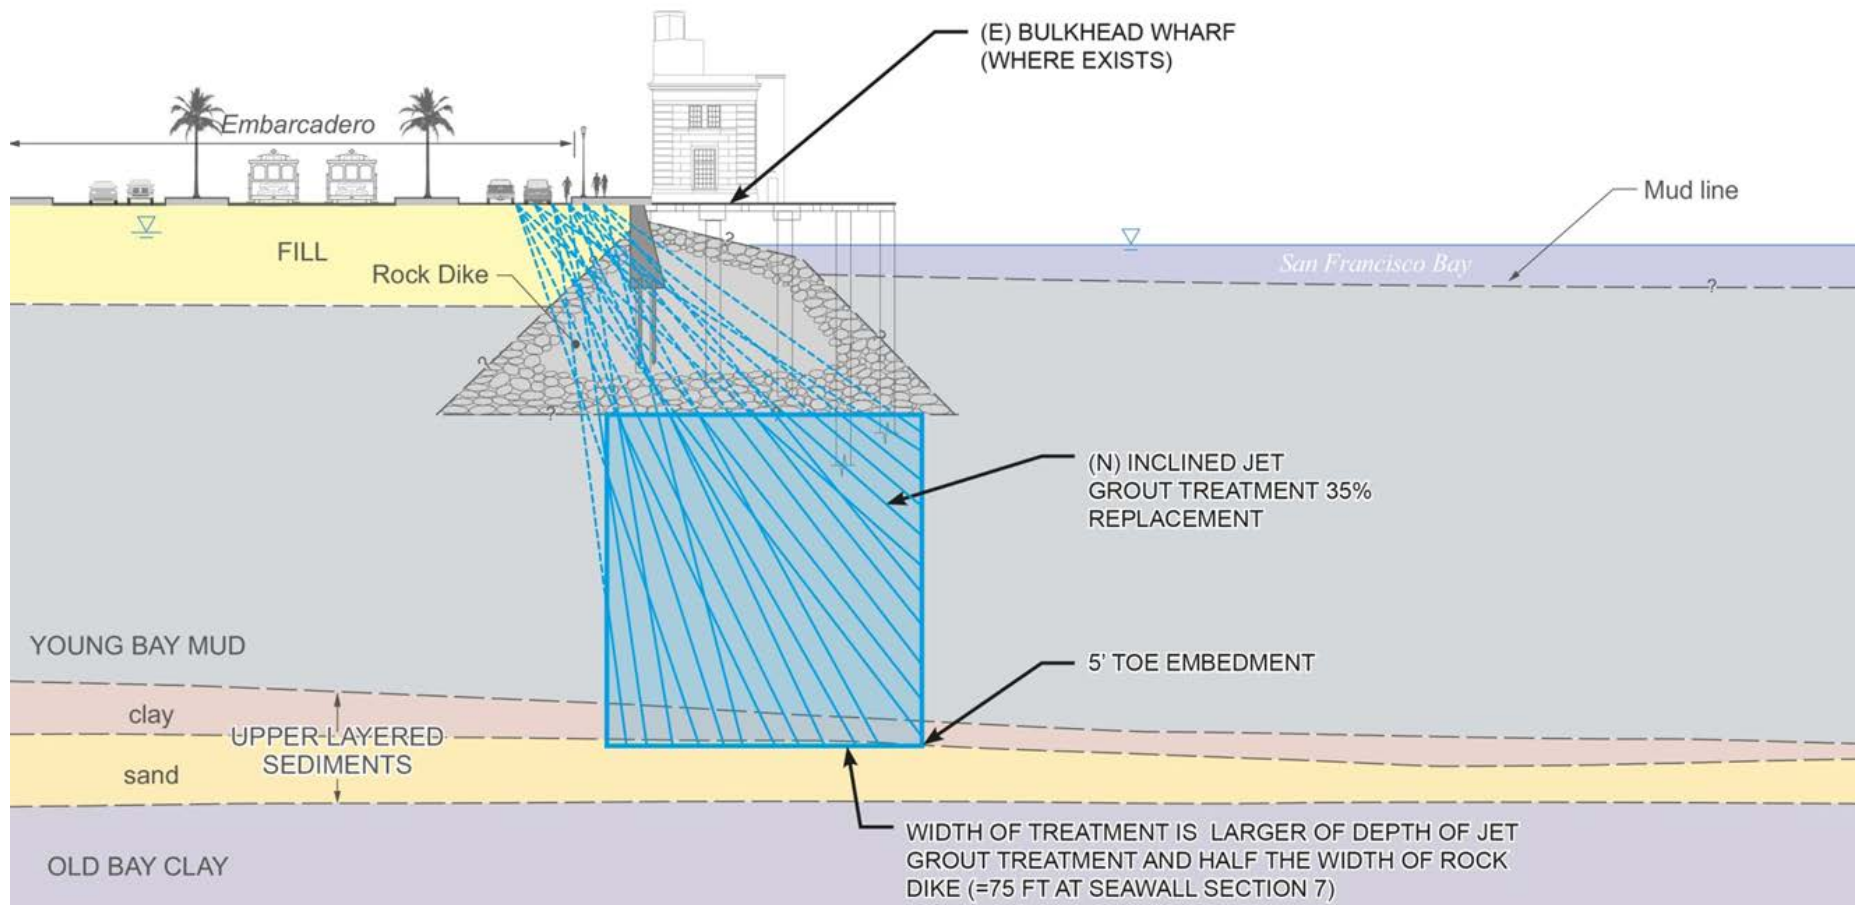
Soil Strengthening Alternative-Jet Grout Under Rock Dike – Inclined
